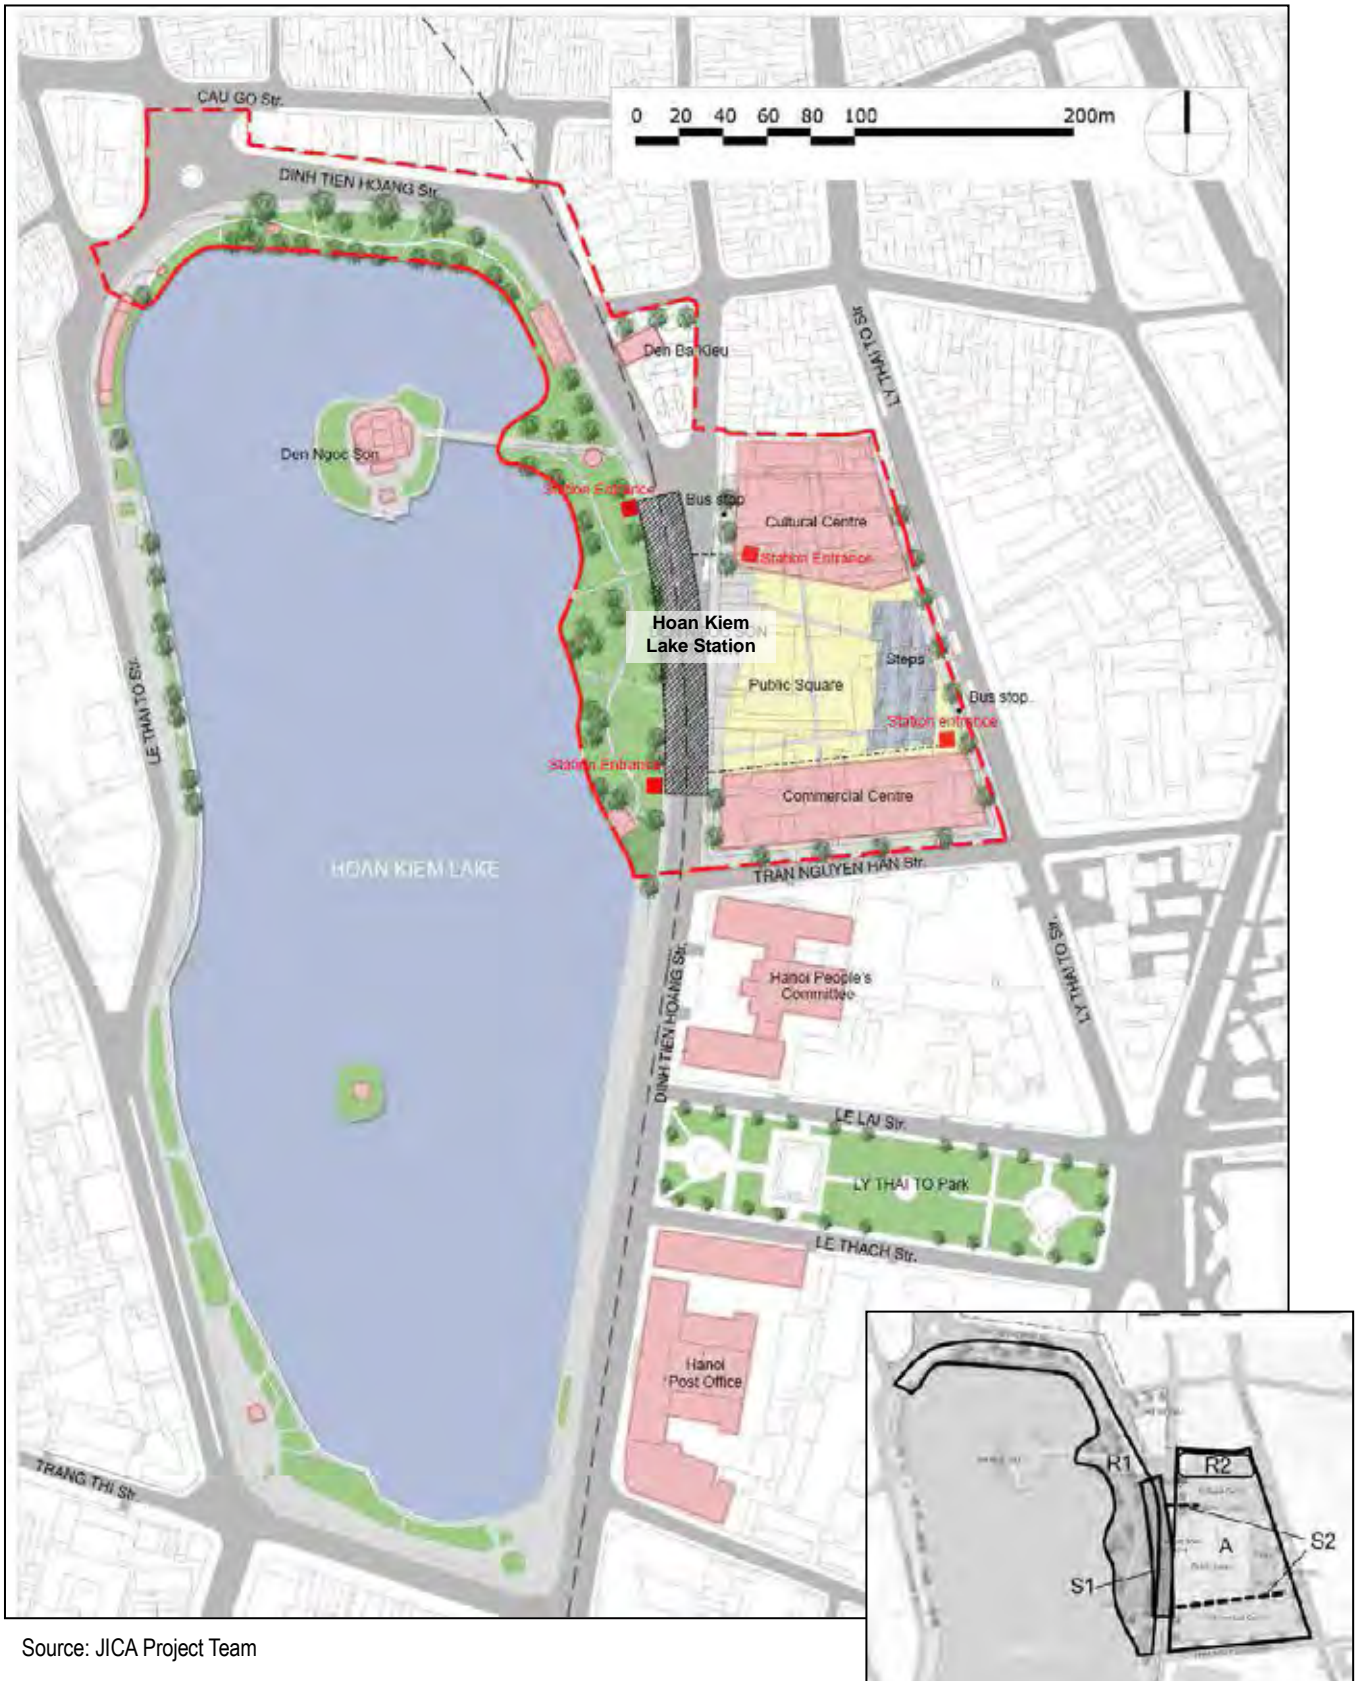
Proposed Building and Landscape Plan for Hoan Kiem Lake Station Area
